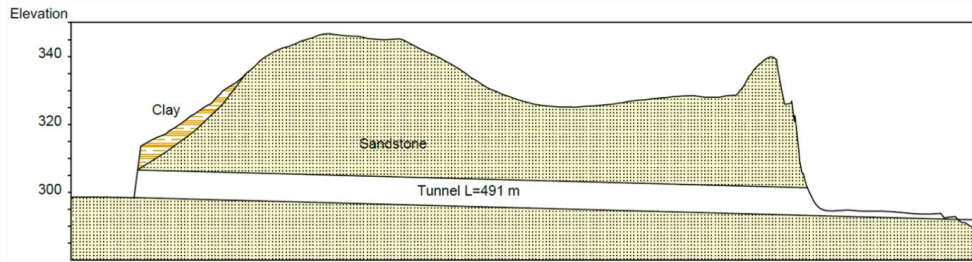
Longitudinal cross-section of Gölçayır tunnel
